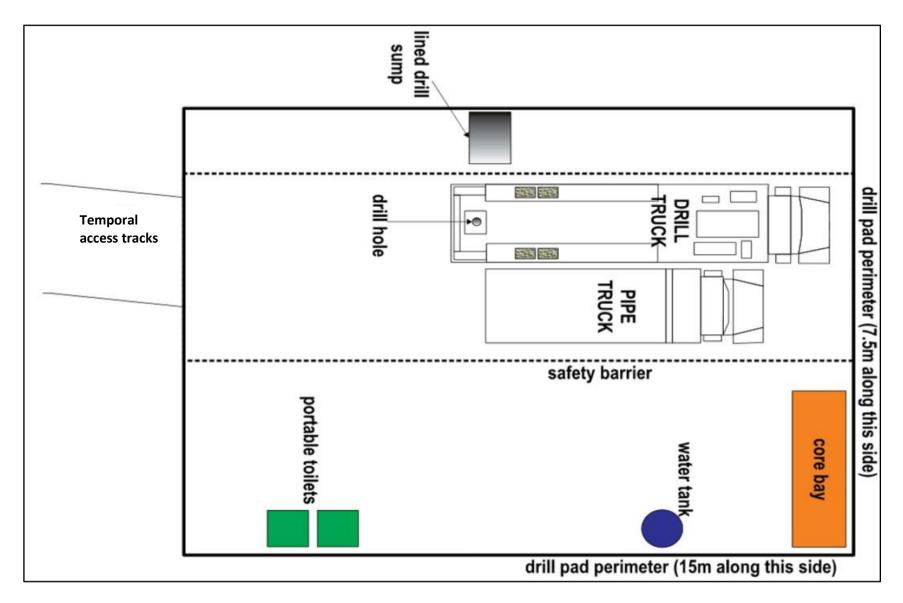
Showing equipment's and space that will be utilized on the drilling site
